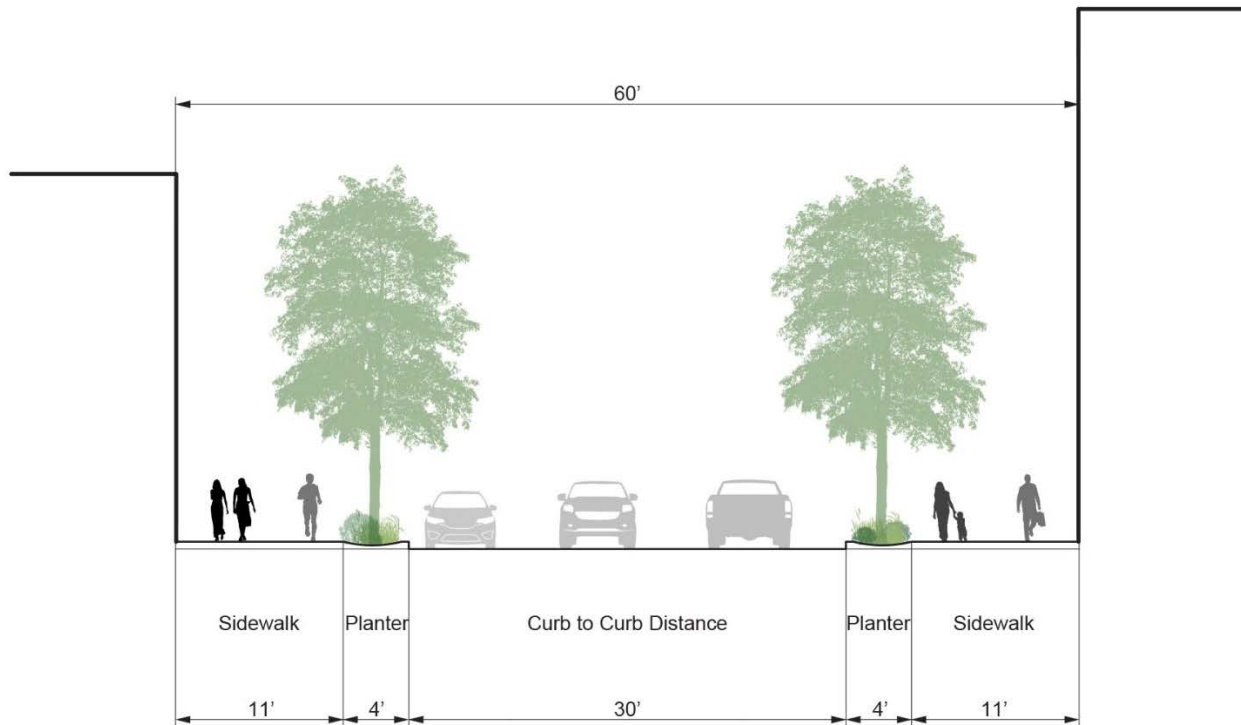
Draft Local Street Cross-Section Concept built with an existing 30-foot curb-to-curb
